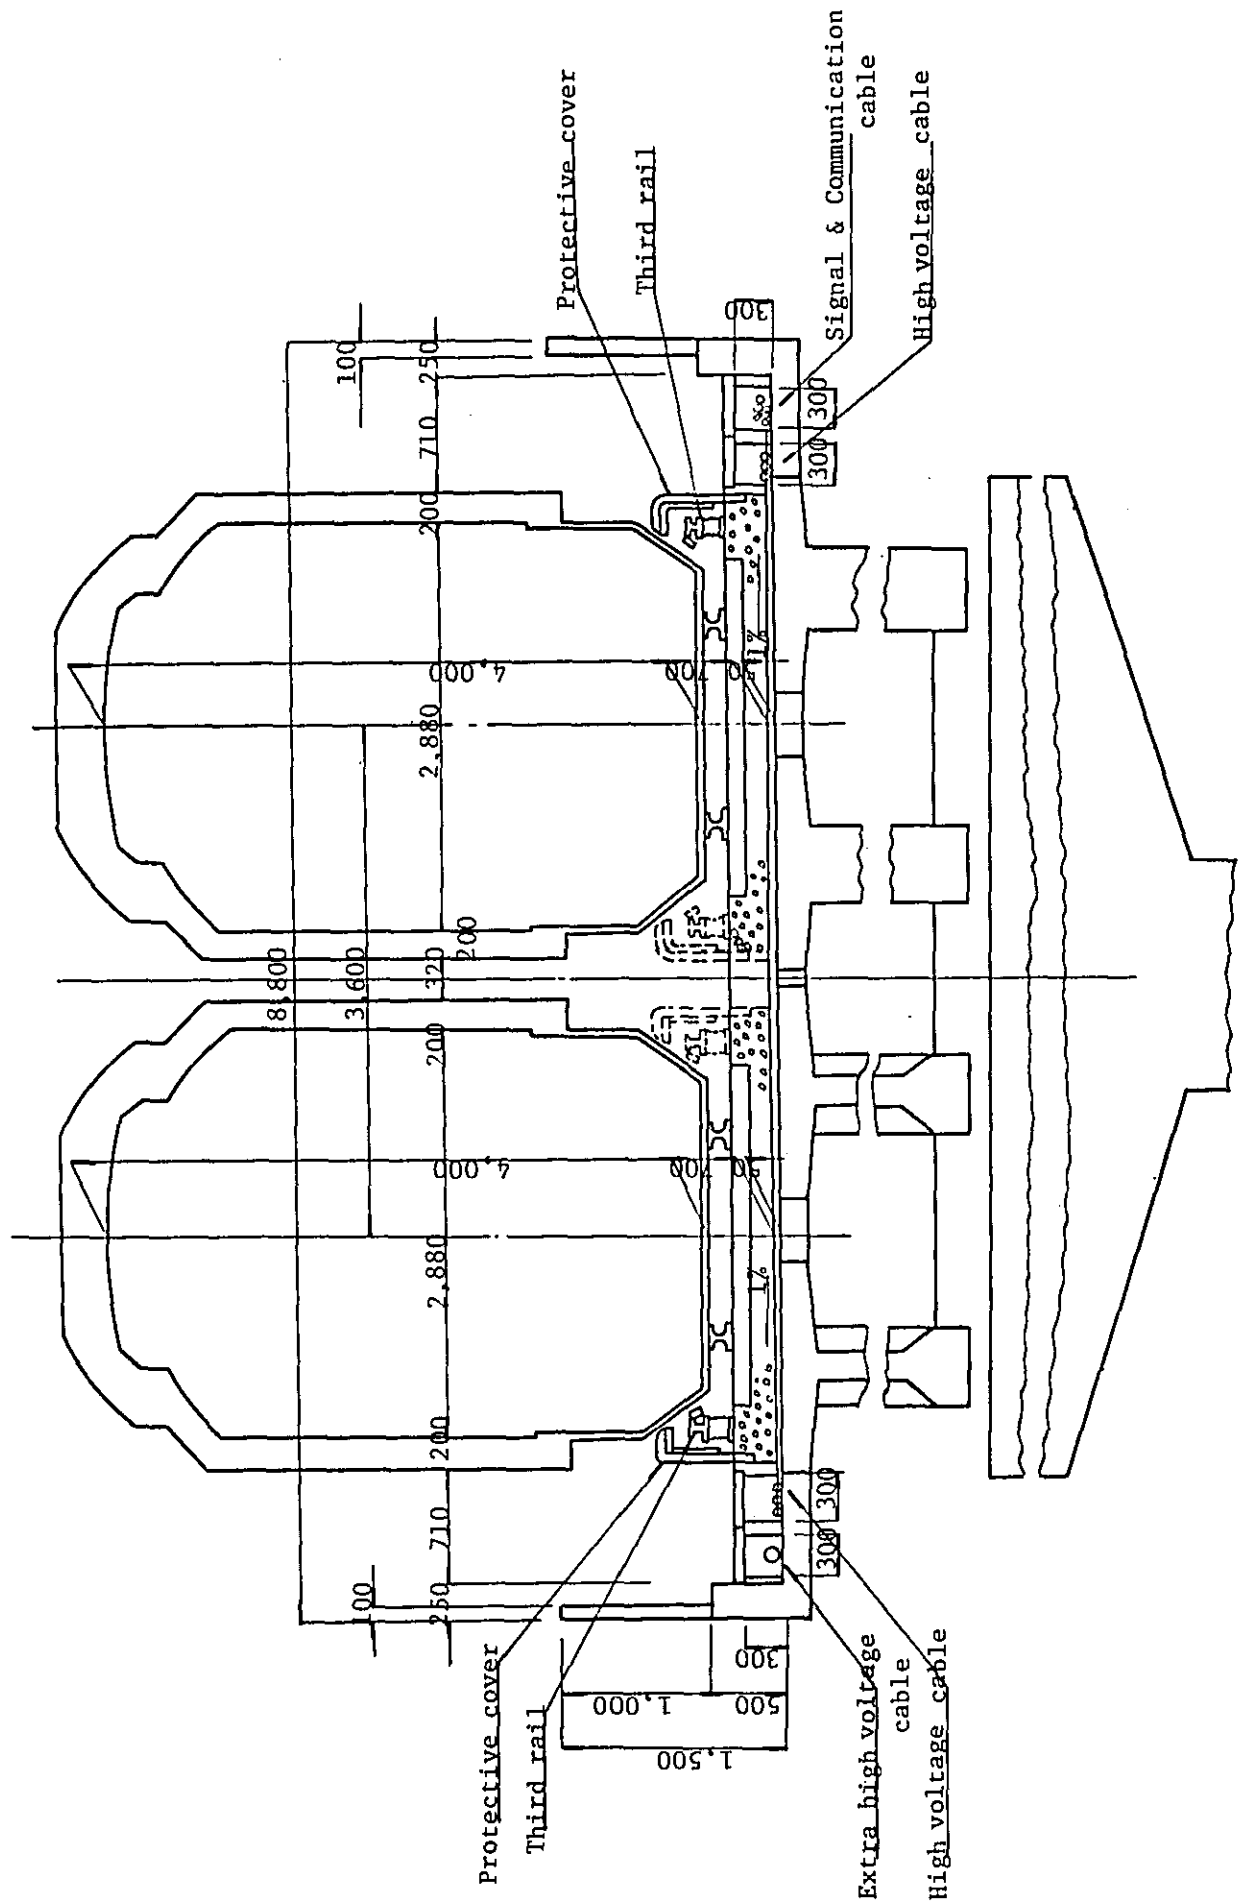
Wayside Cable Layout of Line No. 1 (Elevated Section)
